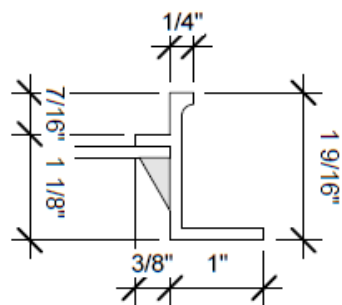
below provides the field measurements of the historic interior and exterior 1/-16-inch thick steel plates used as the typical means of securement at window jambs.
